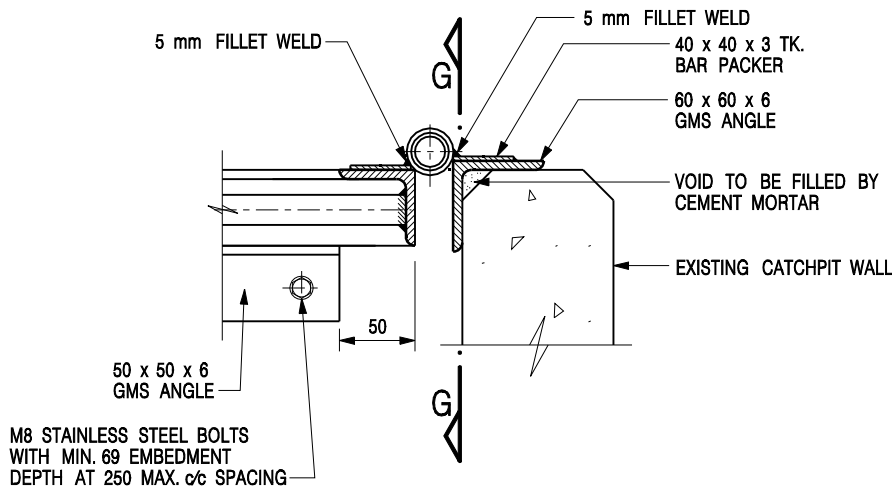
DETAIL 'G' - DETAILS OF STEEL GRATING
